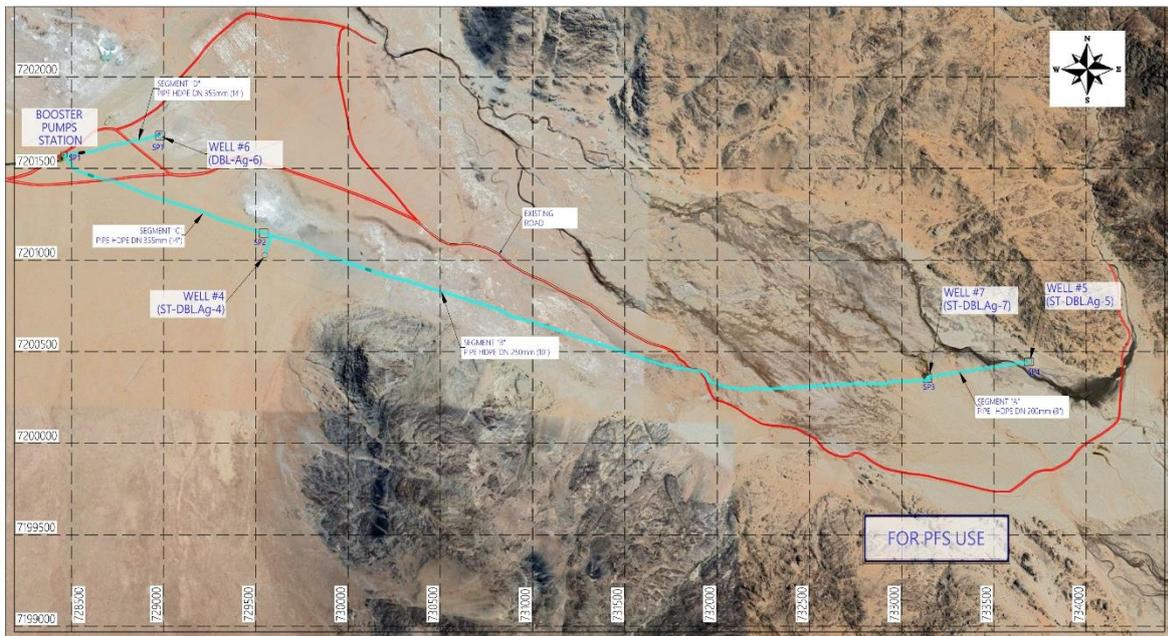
Piezometer/Well Drill Holes and Test Locations
